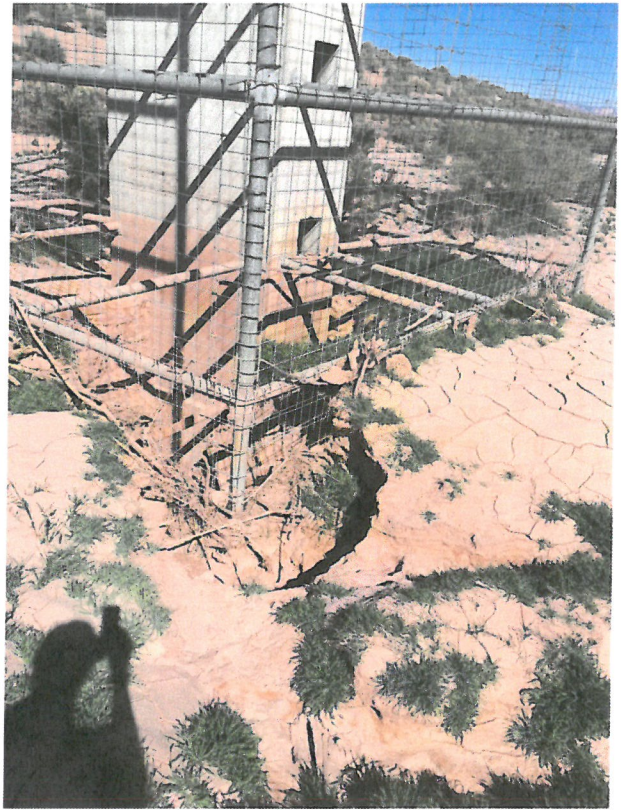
Sediment buildup and erosion at southeast face of drainage structure.
